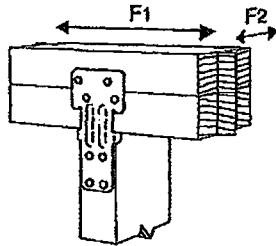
RSP4 Installation: Stud to Double Top Plate
